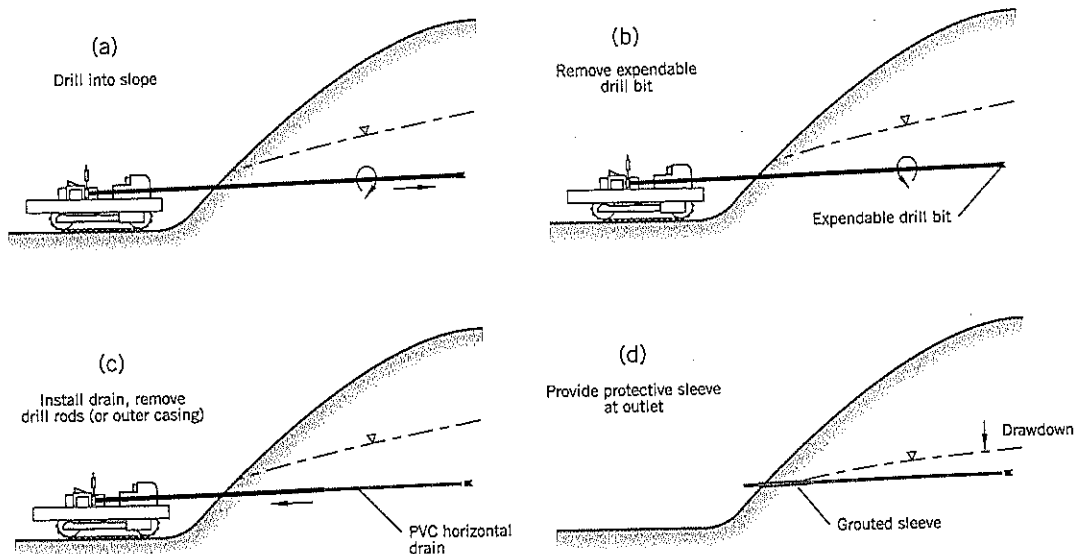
Construction of a horizontal drain (modified from Royster, 1980).
